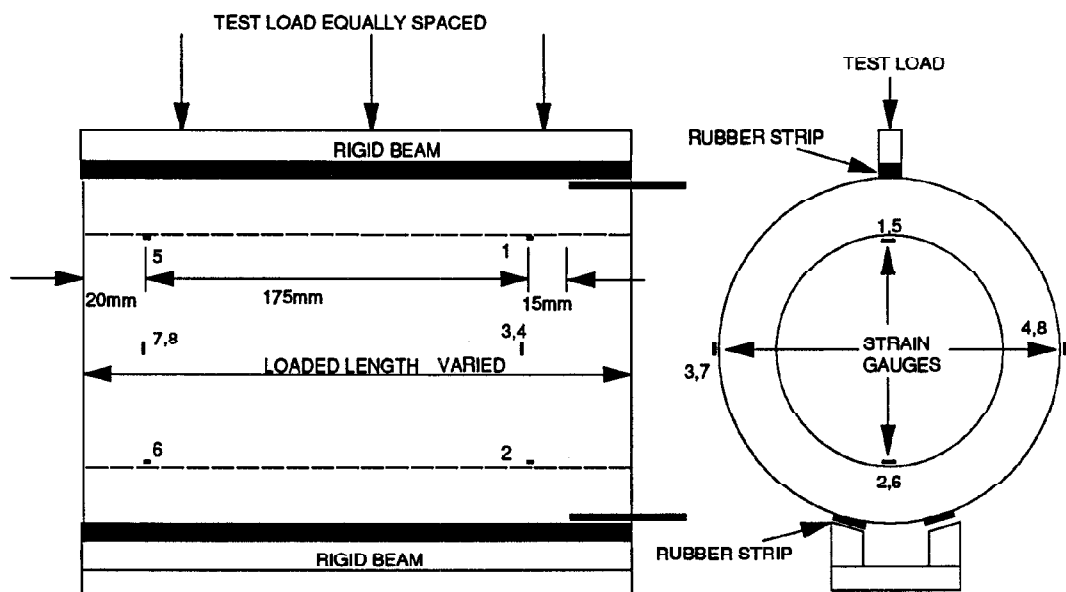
Test arrangement and strain gauge positions on British Standard crushing tests.
